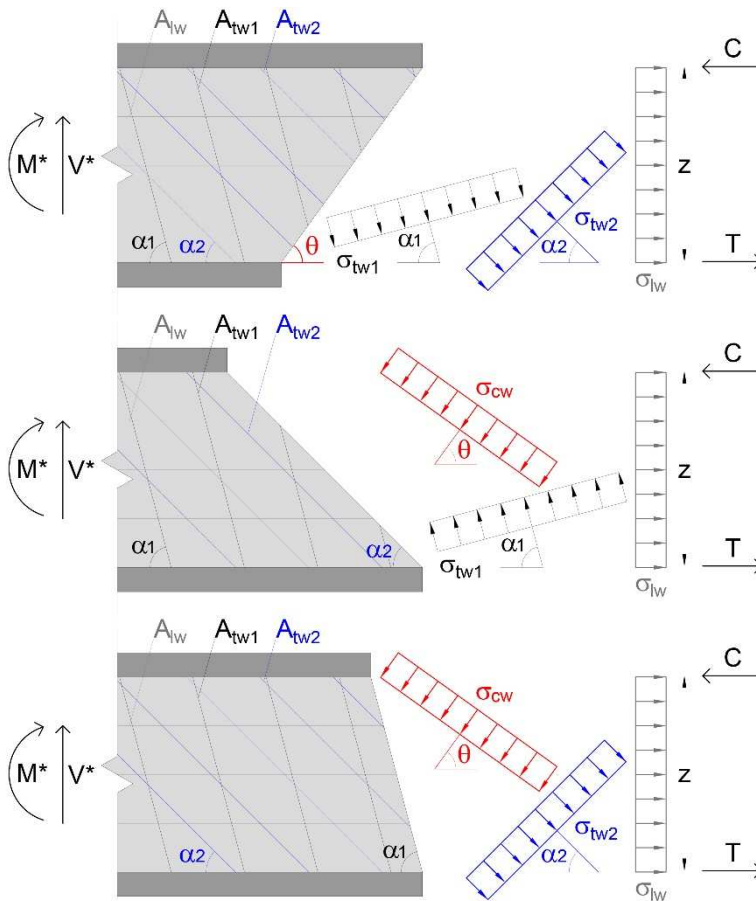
Distinct beam segments obtained through three differently-oriented sections parallel to either one of the two sets of transverse reinforcement or concrete stress field direction
